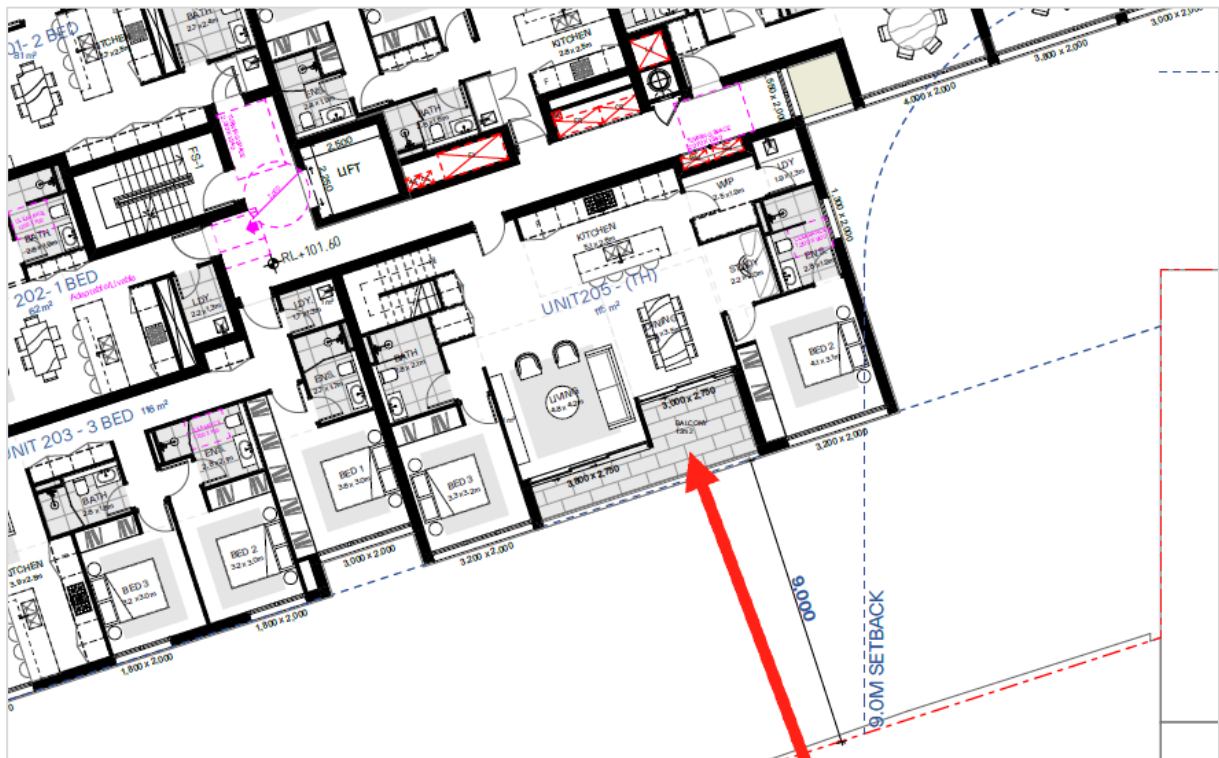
DA35/2024 Approved Plan - Level 2 Floor Plan (Units 205)
